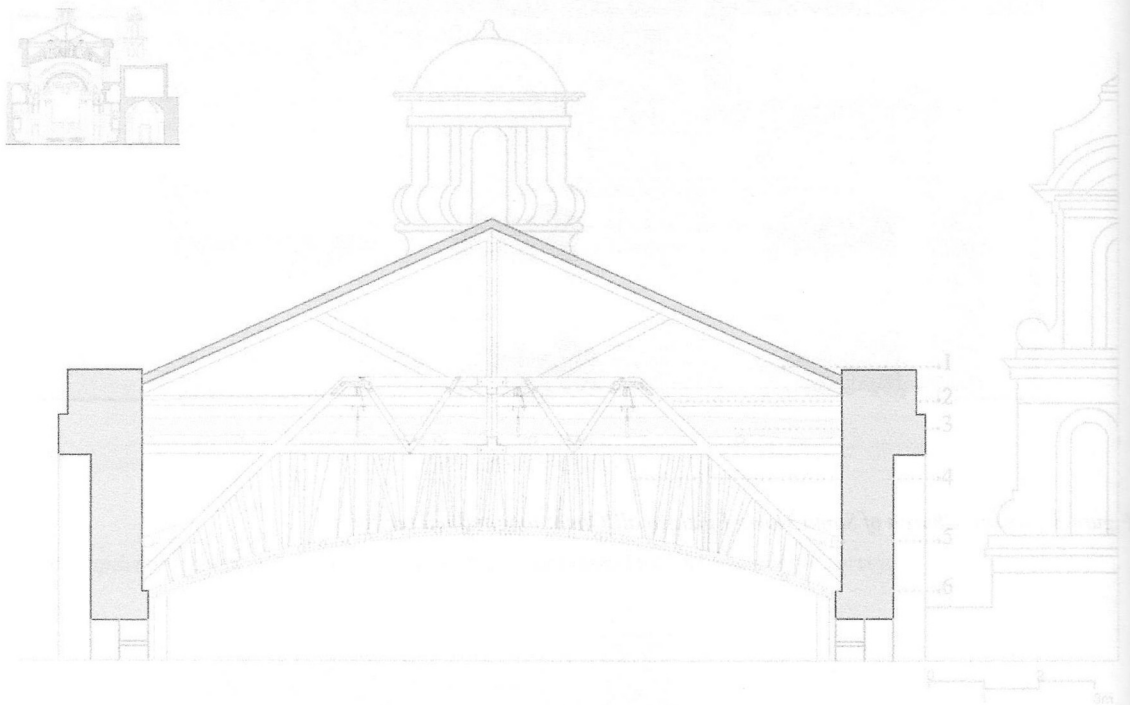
Naples, Church of Santa Maria Egiziaca all'Olmo: construction detail. 1) steel truss; 2) wooden reticular support structure; 3) tie-beam of the existing truss; 4) suspension elements; 5) wooden kerb; 6) wooden vault (ribs, restoni and reeds)
